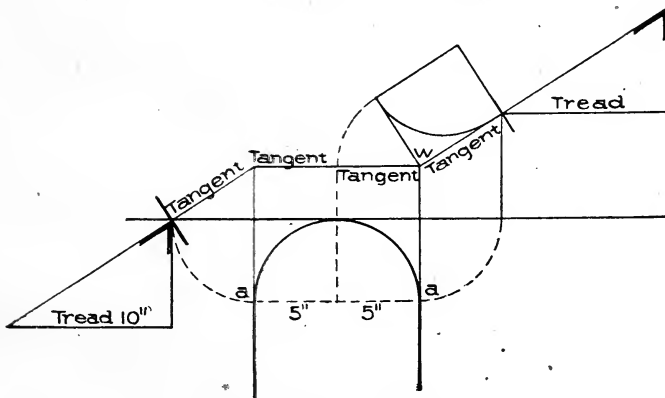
Arranging Risers around Well-Hole on Level-Landing Stair, with Radius of Central Line of Rail One-Half Width of Tread.
